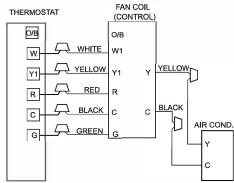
Wiring Layout Air Conditioning Unit (Cooling and 1- Stage Heat)
